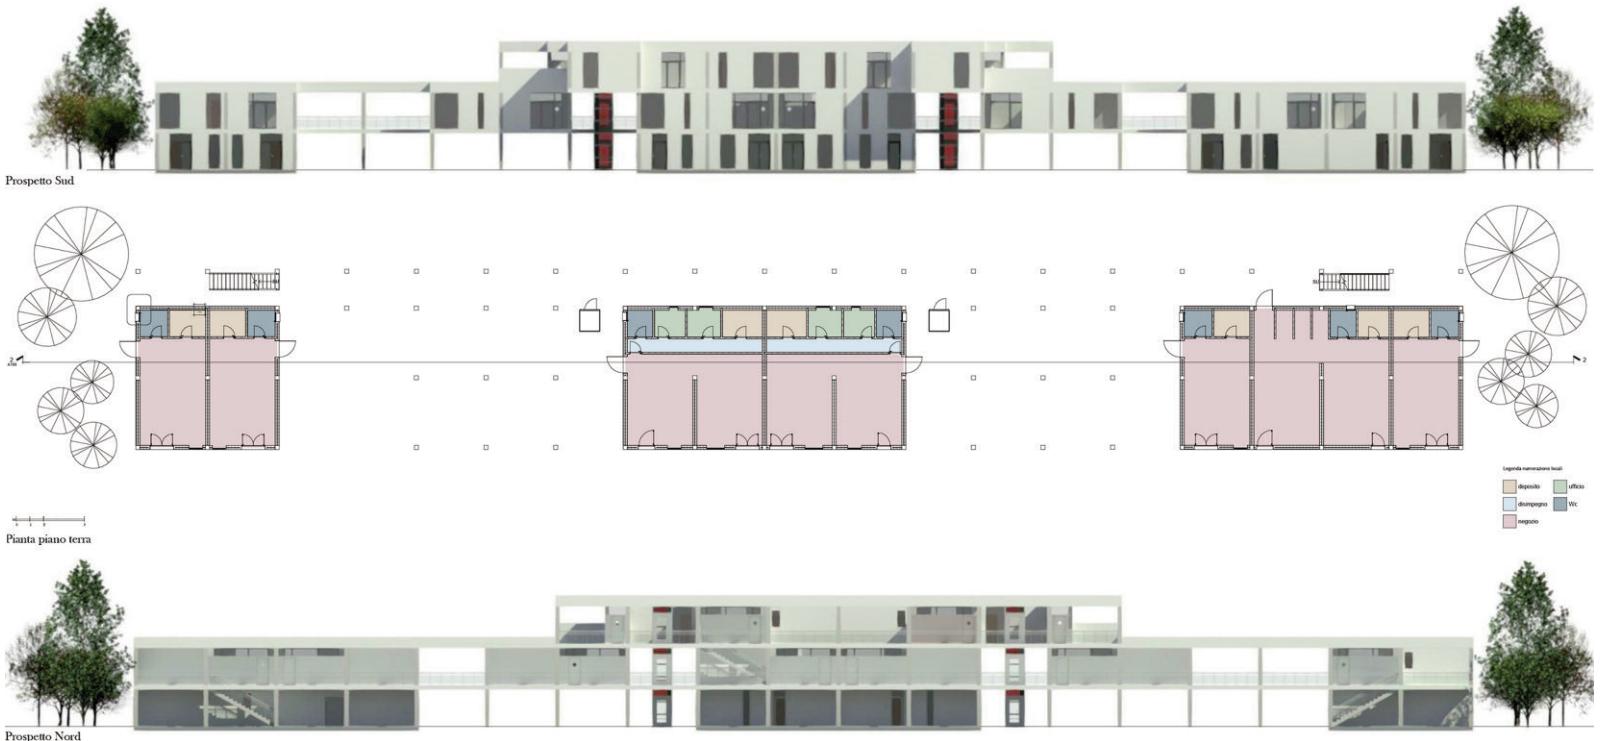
Ground floor plan and North and South elevations from BIM platform (credit: R. Russo).
